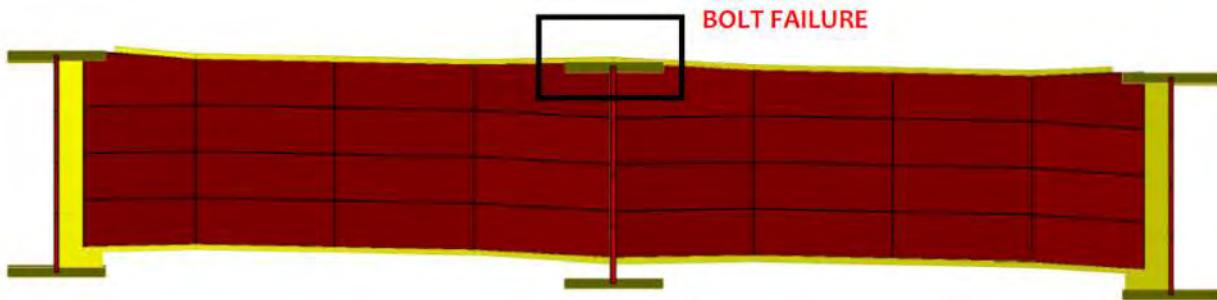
Redundant Load Path Diaphragm with location of connection failure
